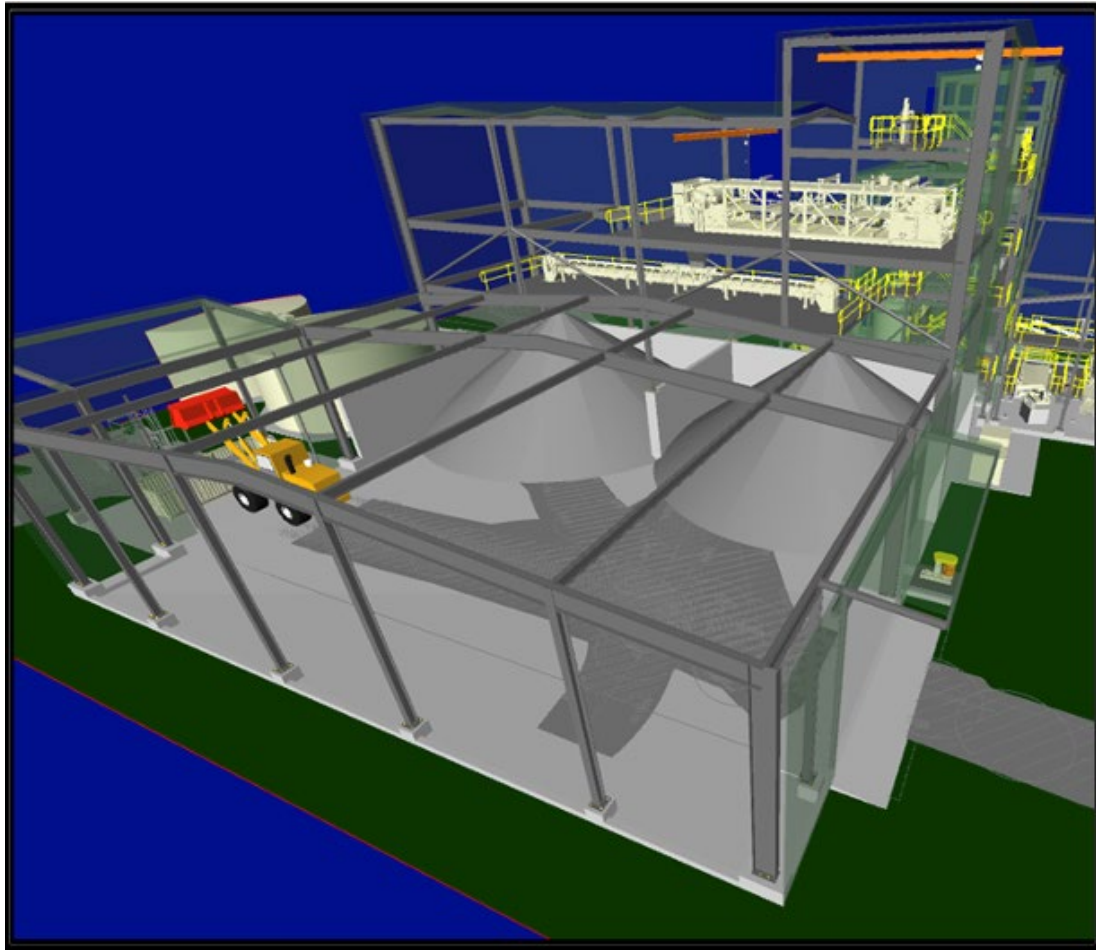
HMC storage and loadout (sheeting removed for internal view of building)
